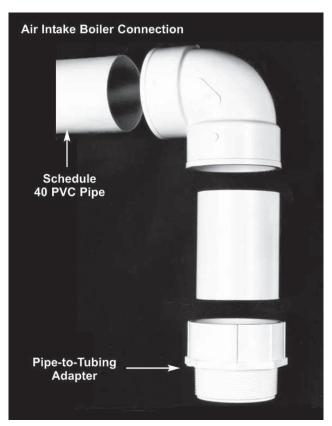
AIR INTAKE BOILER CONNECTION
